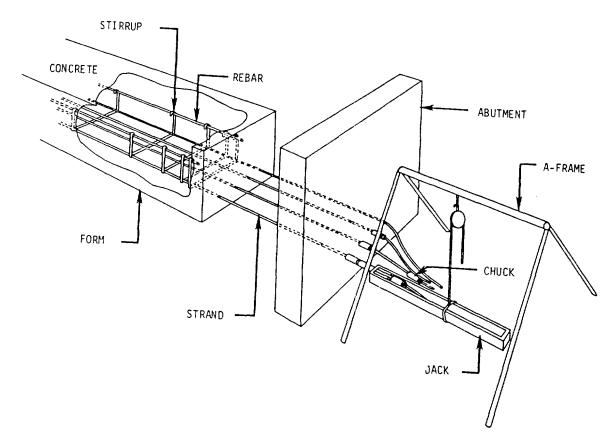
PRESTRESSED AND REINFORCED BEAM FORM
